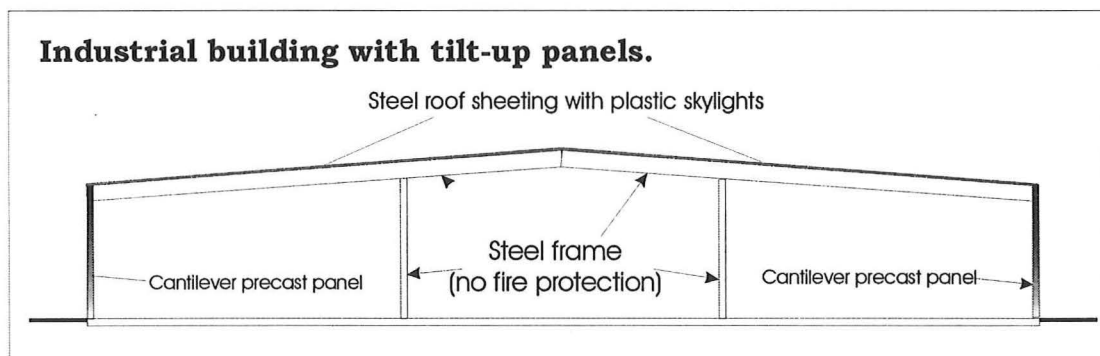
Cross section of a typical modern industrial building in New Zealand.
